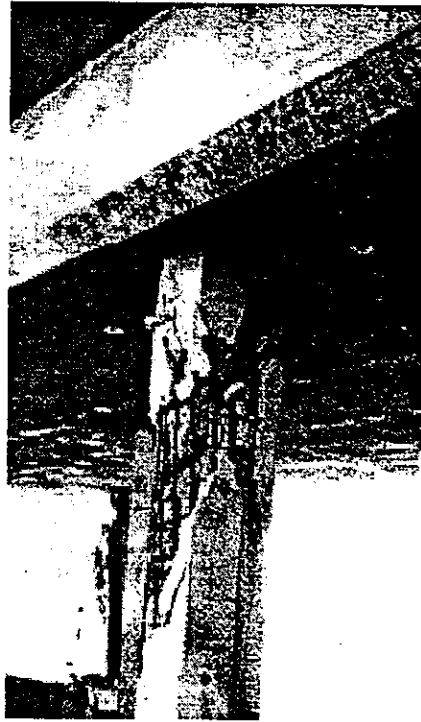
Shear failure at column top of the Foothill Boulevard undercrossing (1971 San Fernando earthquake)
